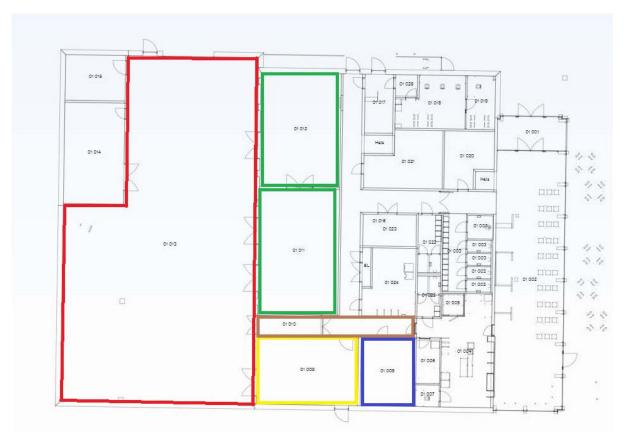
3 Ground floor plan with six test environments. Garage (room: 01 013) in red, 3D-print laboratories (rooms: 01 011, 01 012) in green, corridor (room: 01 010) in brown, geolab (room: 01 009) in yellow and geomatics equipment (room: 01 008) in blue.
